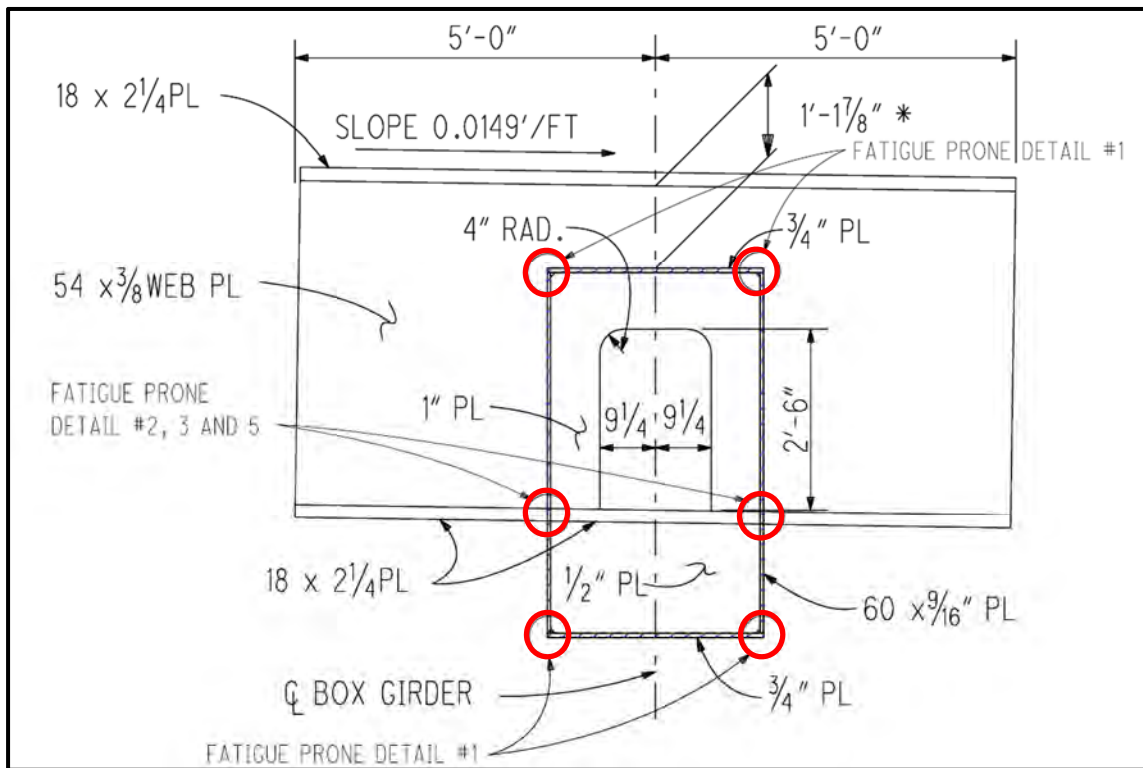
STA-077-0912 – Fracture Critical integral steel box girder fatigue prone details
